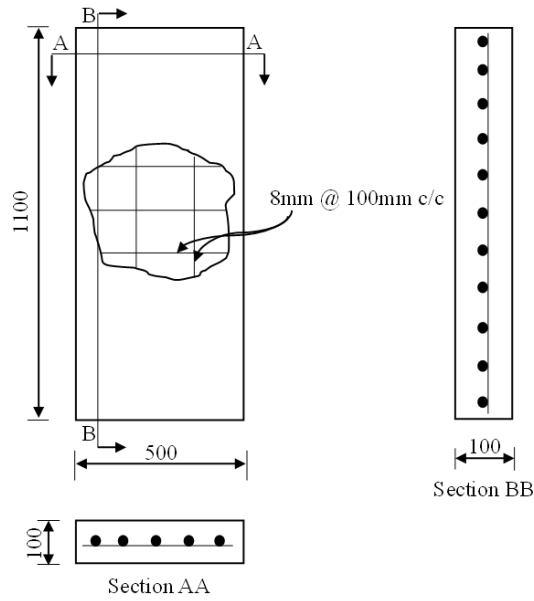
Geometric details of solid concrete panel (All dimensions are in mm)
